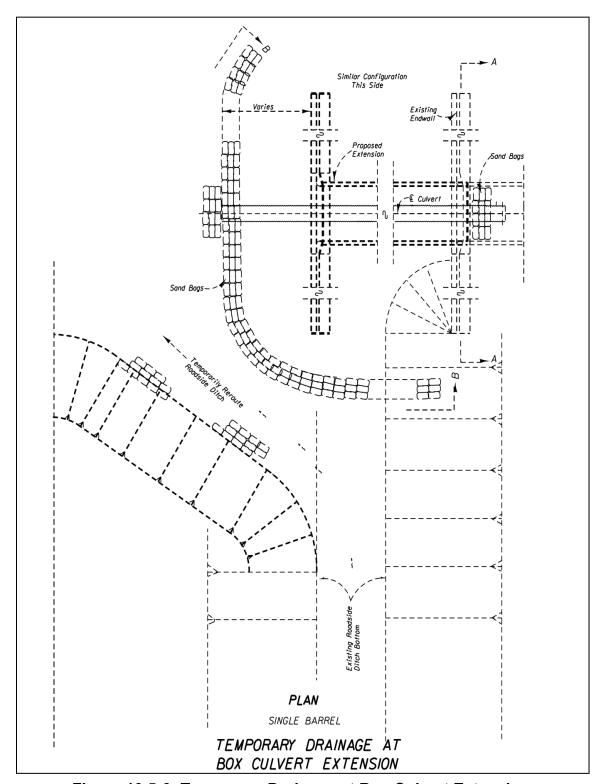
Temporary Drainage at Box Culvert Extension
